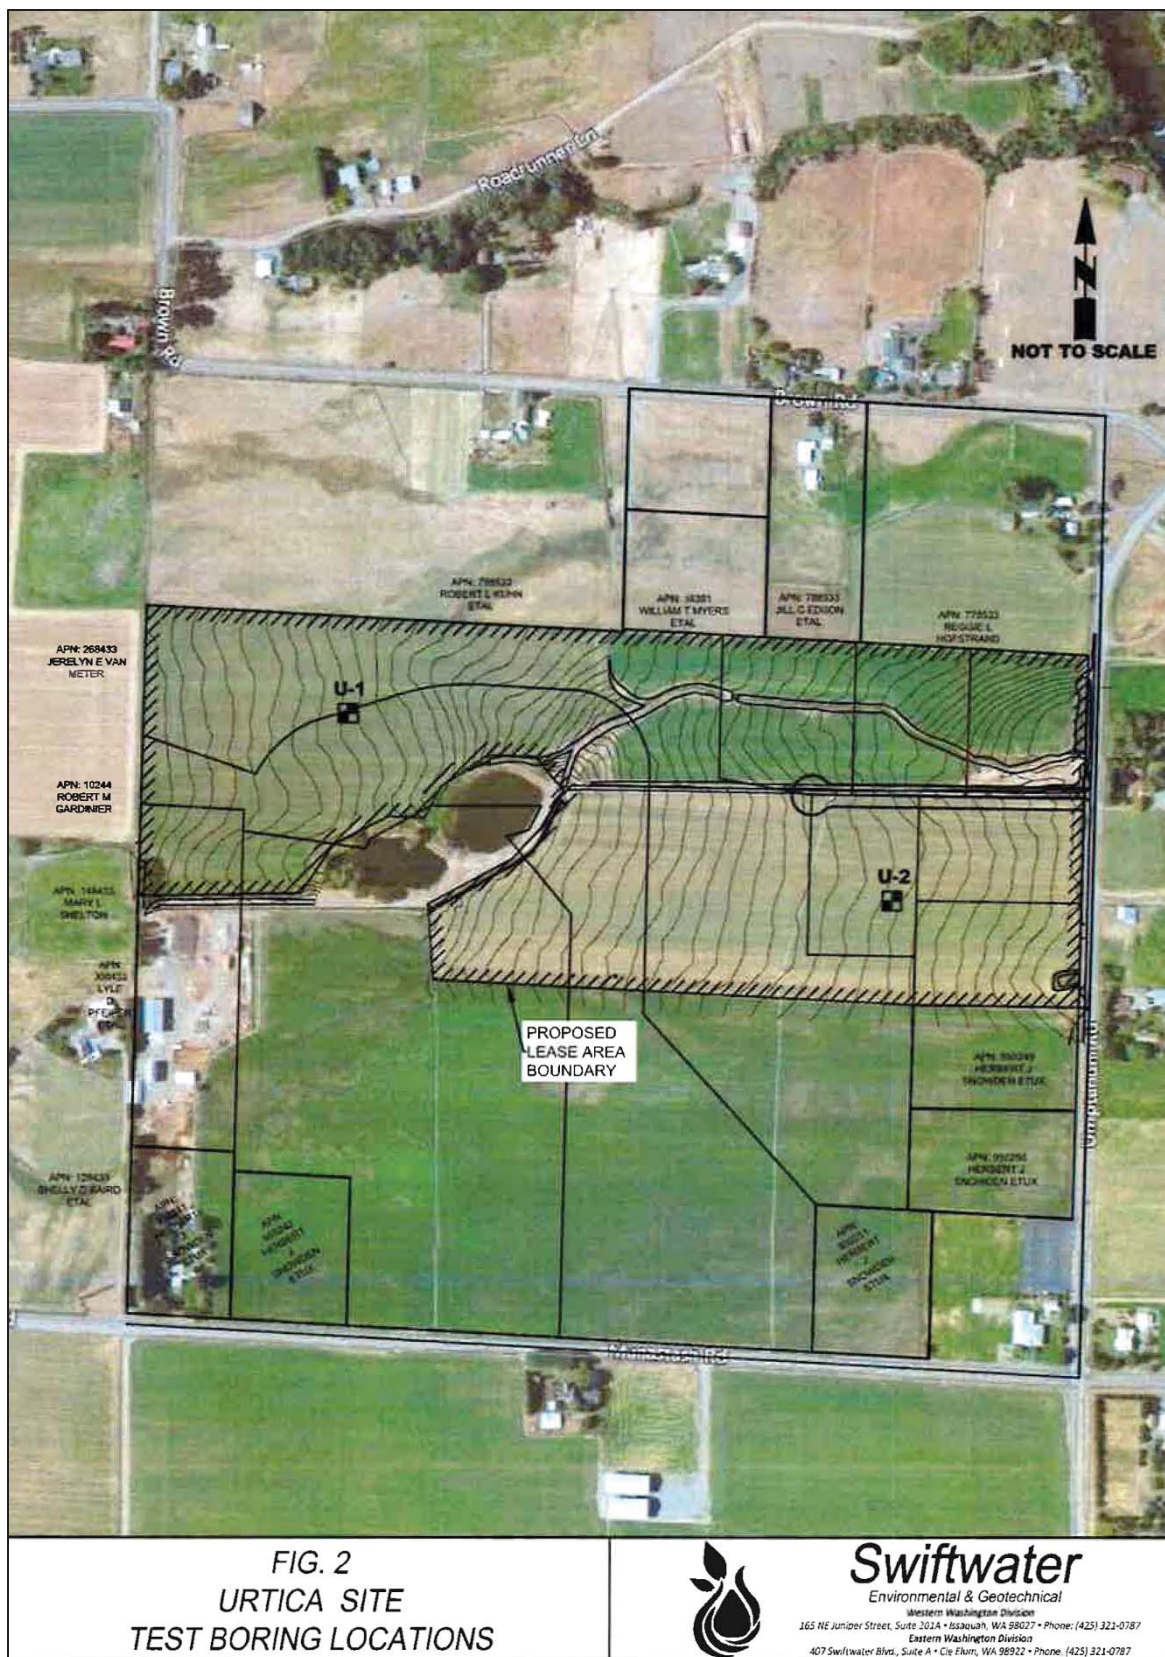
Boring locations at the Urtica Solar Project site.
